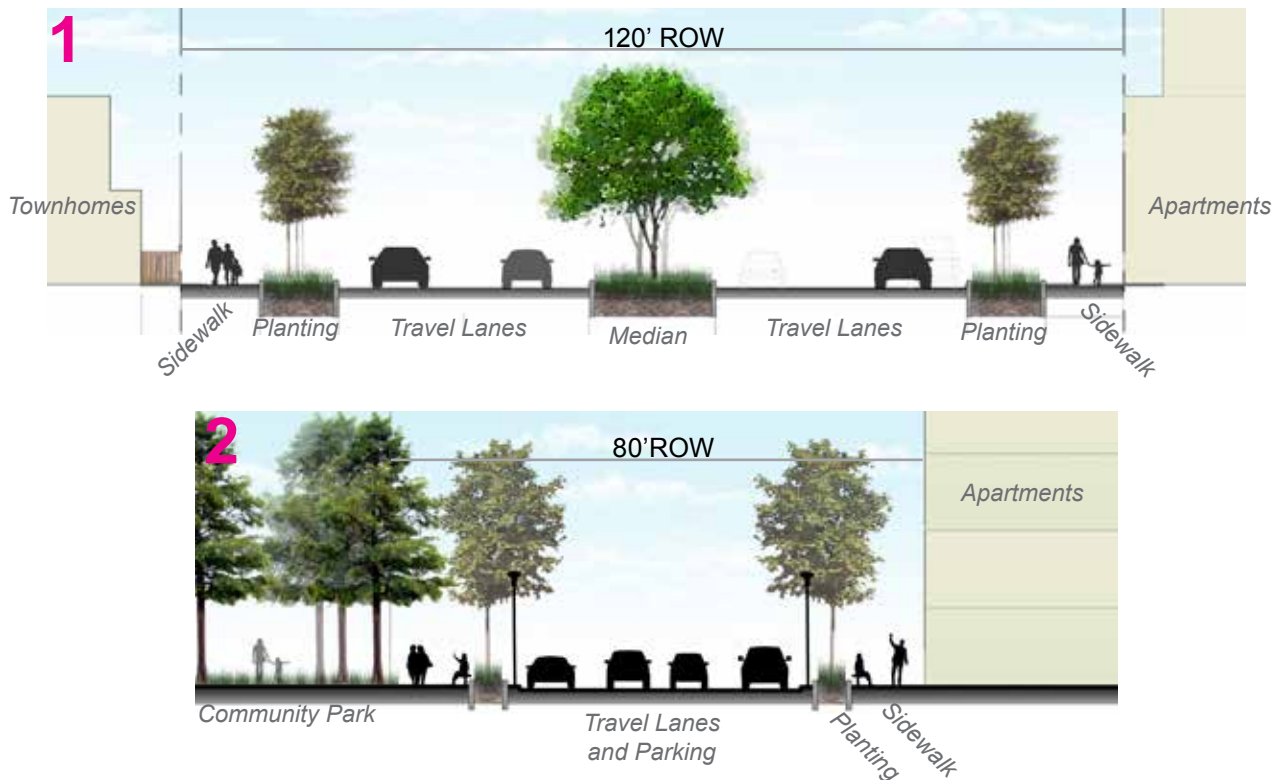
Kuykendahl Road Catalyst Roadway Sections
